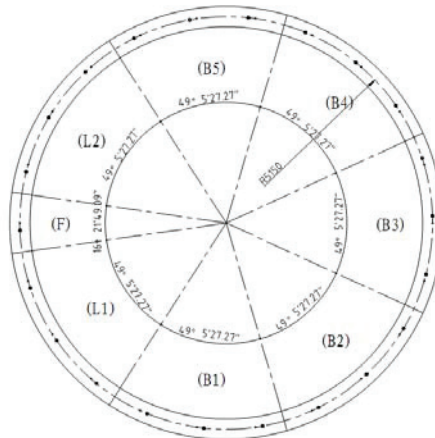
Segment layout of Guangzhou Shiziyang Tunnel
